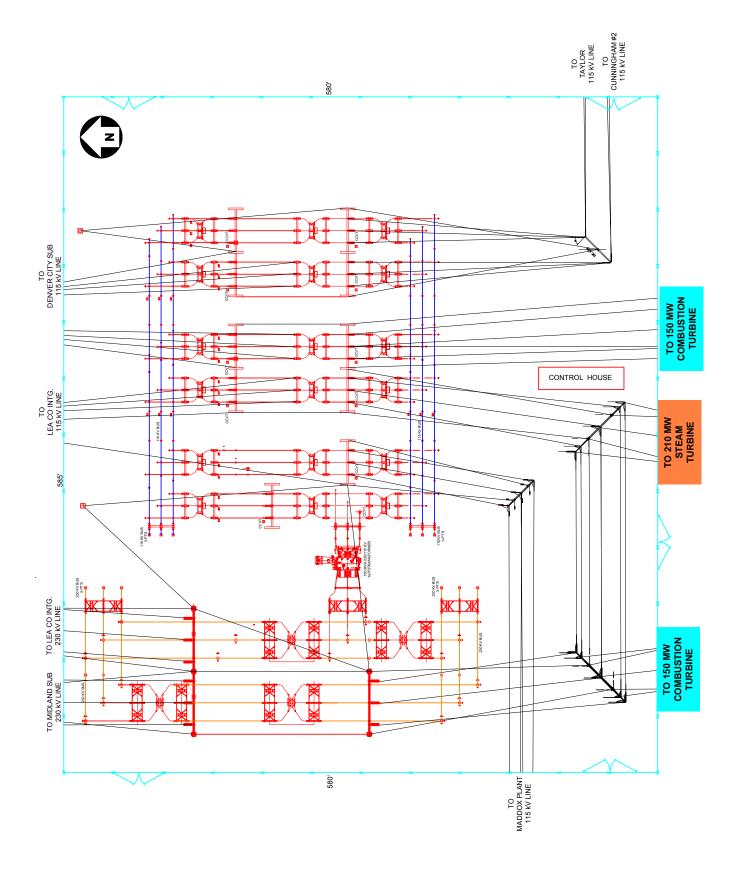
Hobbs Plant Interconnection Facility Plan View
